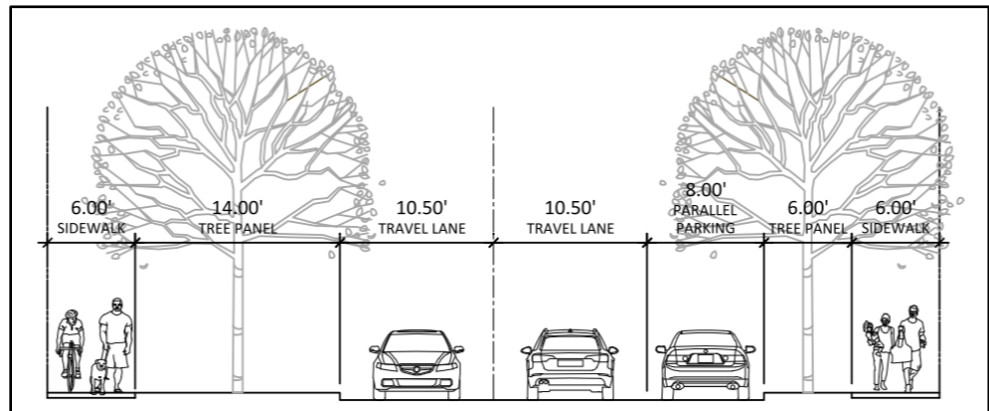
Proposed Cross-Section for Green Segment of Street A, as conditioned.
